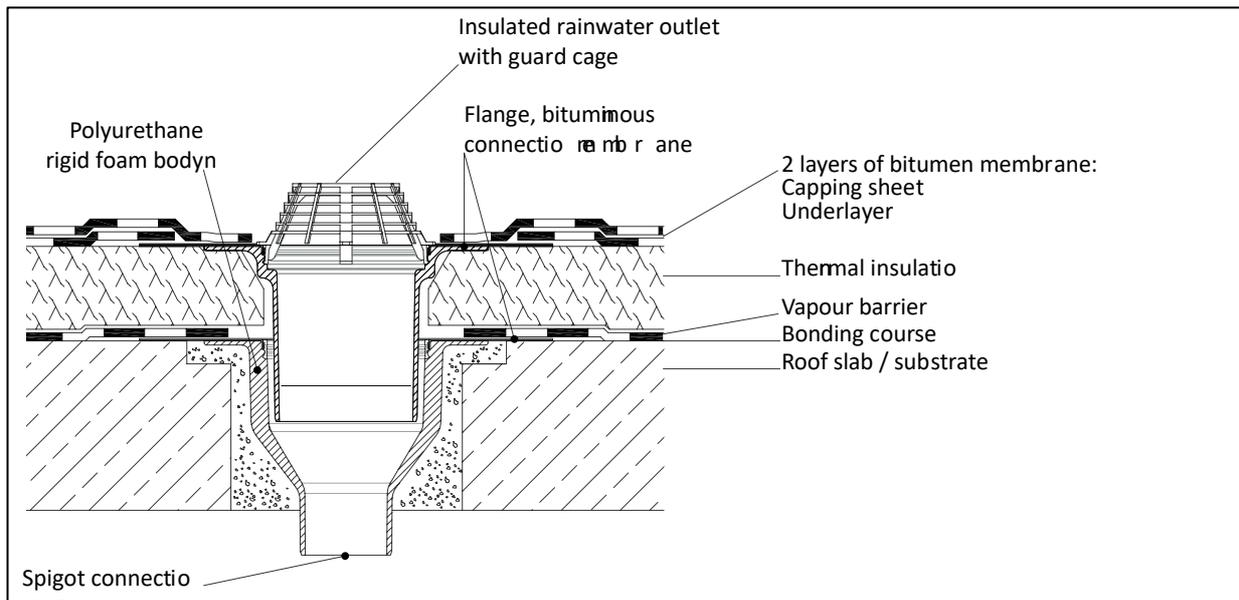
Schematic drawing of a two-part roof outlet for a heat insulated roof with vapour barrier and a conventional gravity drainage systems
